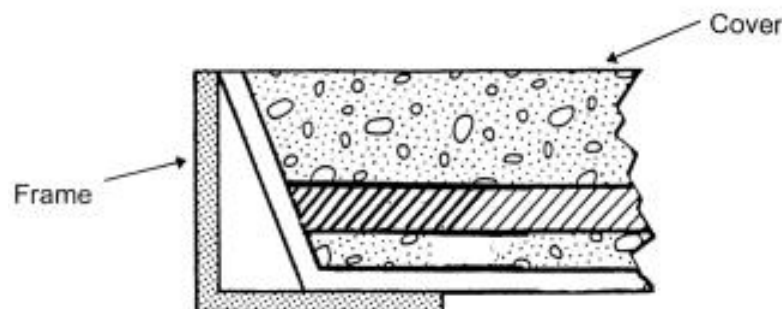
Frame and Covers Footway to BS EN124 Class B125 – Type 'C' Seating
